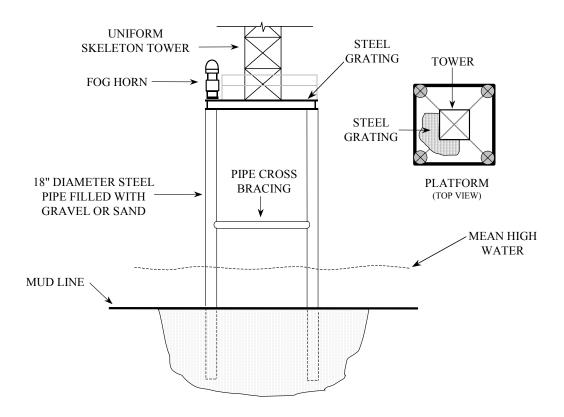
Multiple Pile Platform Structure (Steel)
